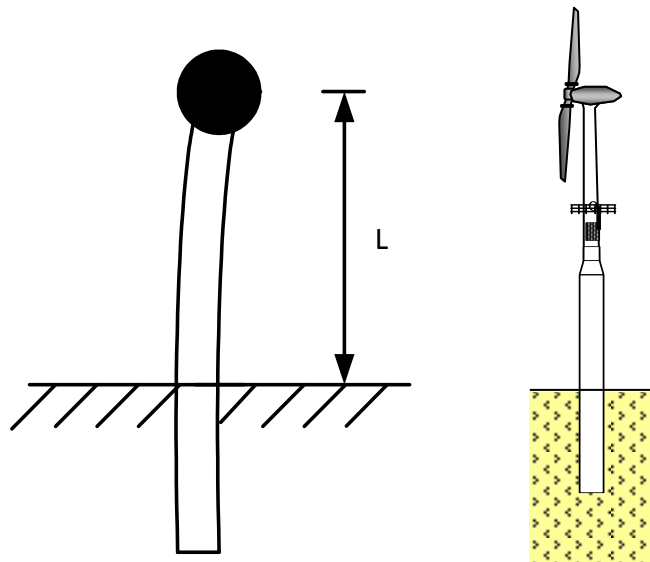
Rotated cantilever beam to have a structure with similar boundary conditions
